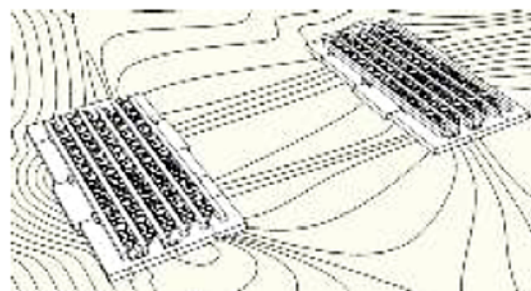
Round wood foundation base of Konjic Bridge [6]
